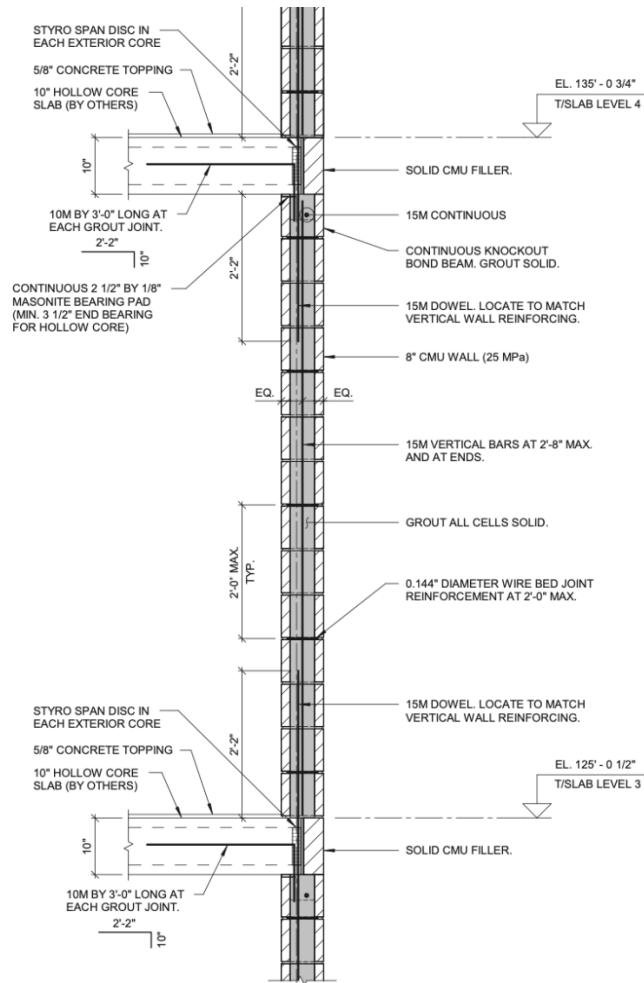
Transversal view of an exterior masonry wall with a hollow-core slab and its detailing (Smith et al. 2020).
